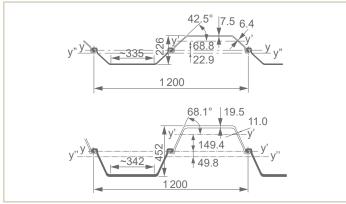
Sheet piles used in the laboratory tests. PU 6 (top) and PU 32 (bottom).
